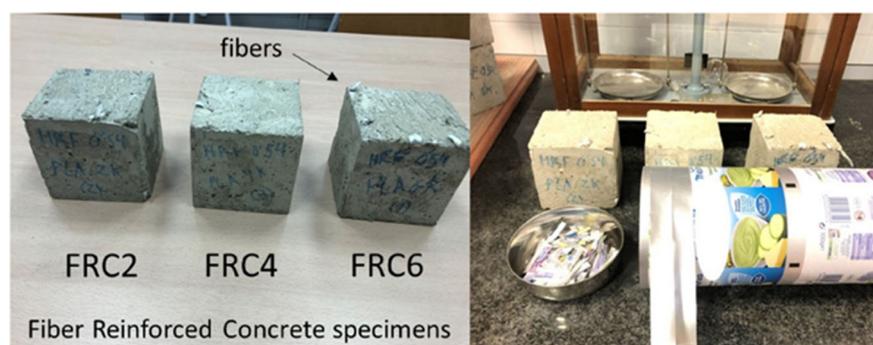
Concrete specimens of FRC with RPF: FRC2, FRC4 and FRC6.
